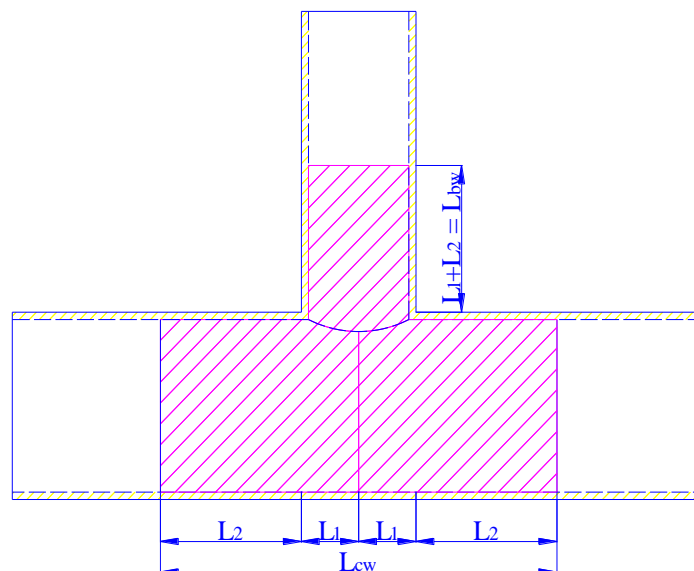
Wrapping of FRP sheets on tubular joint – schematic view
